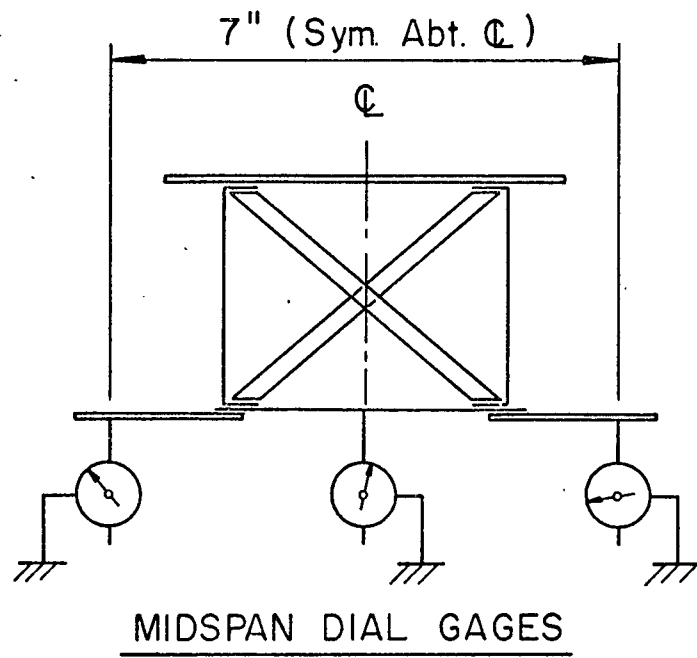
Dial Gage Arrangement - Specimen M2
